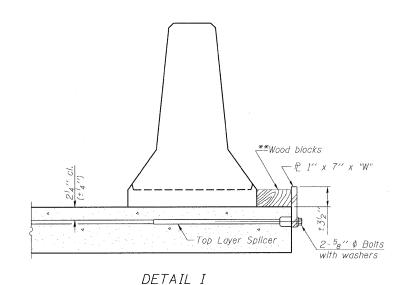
Detail I - With Bar Splicer or Couplers: Connect one (1) 1"x7"x10" steel £ to the top layer of couplers with 2-58" \$\phi\$ bolts screwed to coupler at approximate & of each barrier panel.
